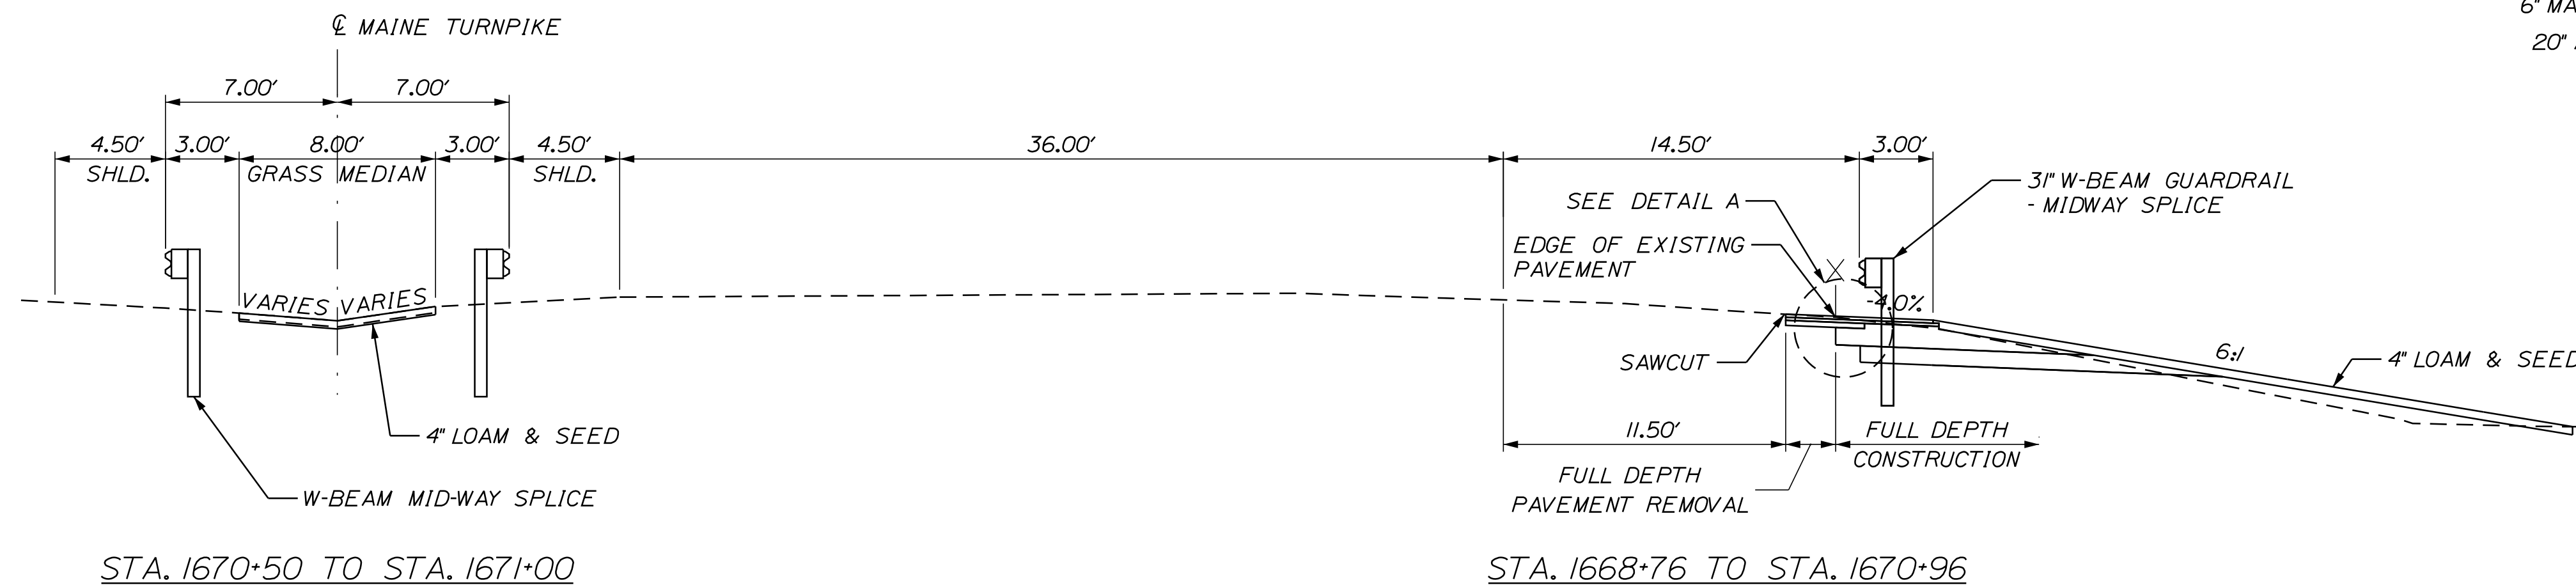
DETAIL B - C-D ROADWAY AND EXIT 36 RAMPS
